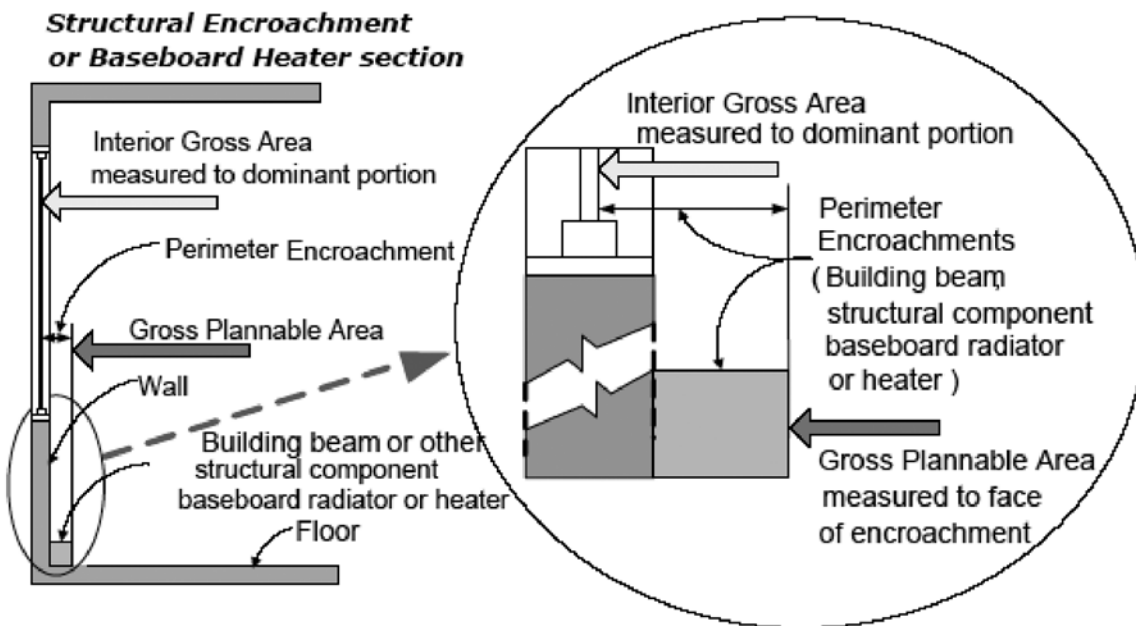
Structural Encroachment or Baseboard Heater Section
